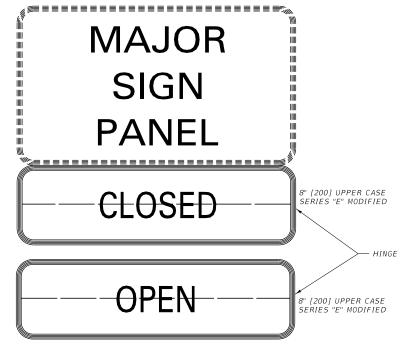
DETAILED DRAWING REFERENCE STANDARD SPEC. SECTION 619, 704
